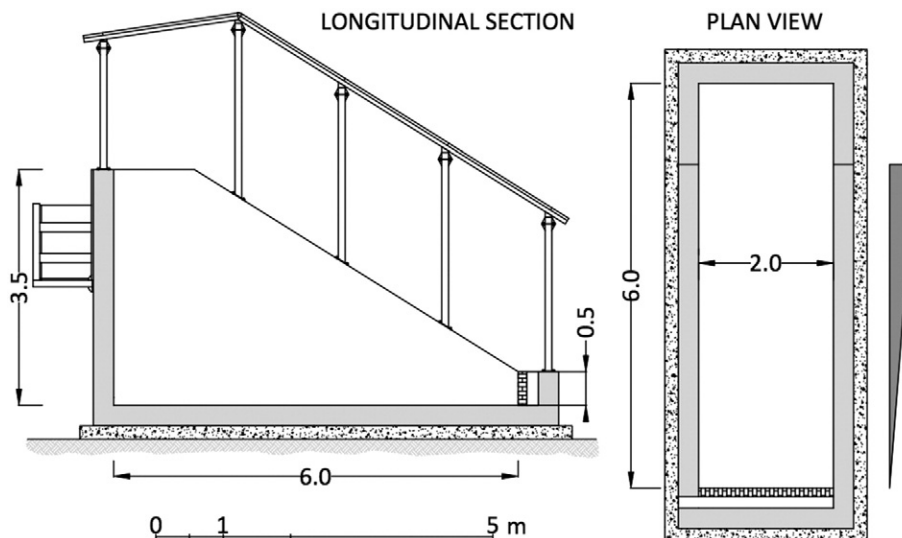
Longitudinal section and plan view of the artificial hillslope.
